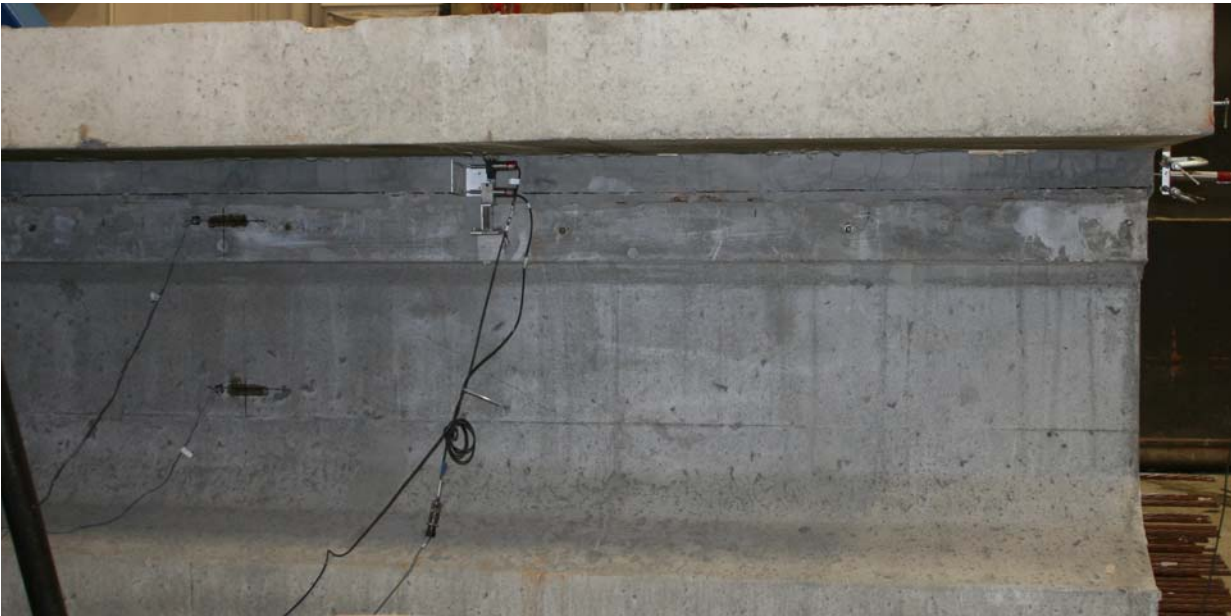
Photo. Haunch connection on south face at east end of test specimen when applied shear load in east end was equal to 1575 kN (354 kips).
